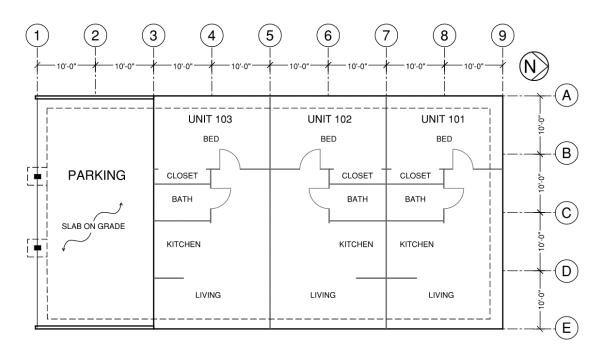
First story of the short-side-open archetype with wing walls. A large portion of the first story is occupied.
